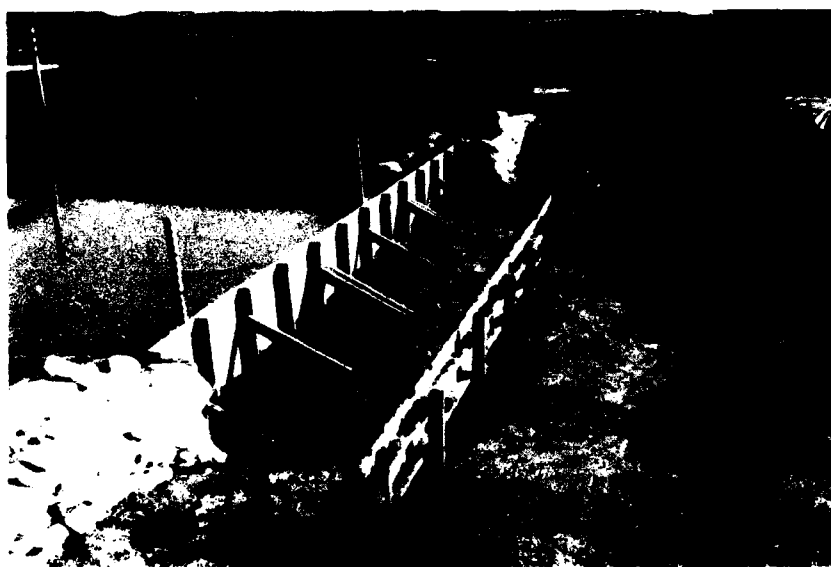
Landside view of Section 4-5 at the end of the 2.0-ft static differential head test
